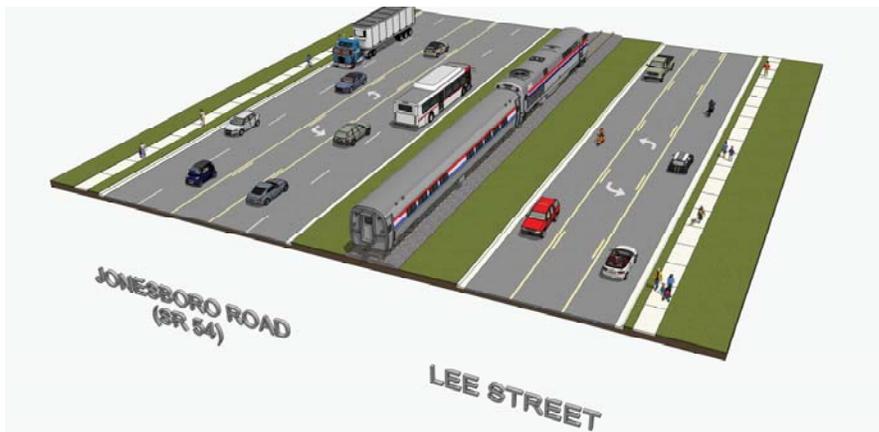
Jonesboro Road and Lee Street - Existing Conditions (sidewalks at some locations are missing)
